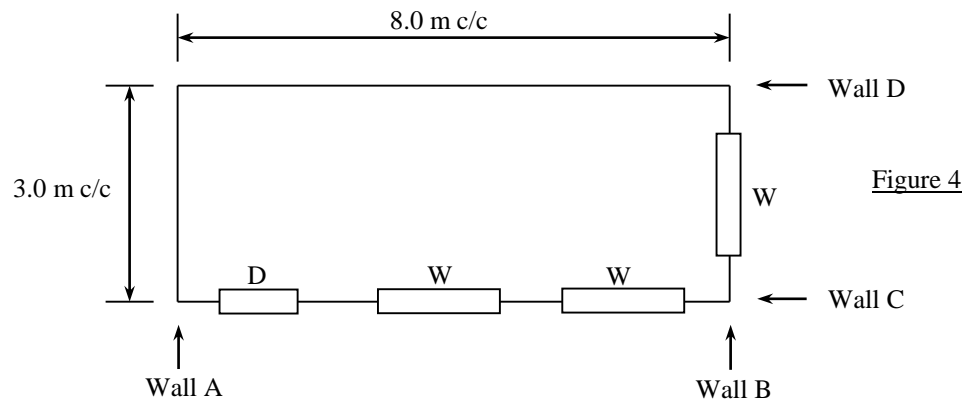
shows the plan of two storied brick masonry important building proposed at Zone III. Consider the thickness of wall A & B as 460 mm and of wall C & D as 340 mm. Decide the maximum size of windows for wall C considering width of door as 900 mm using IS: 4326 provisions. Also, enlist in detail with sketches, the necessary strengthening arrangements recommended for this building as per IS : 4326 provisions.
